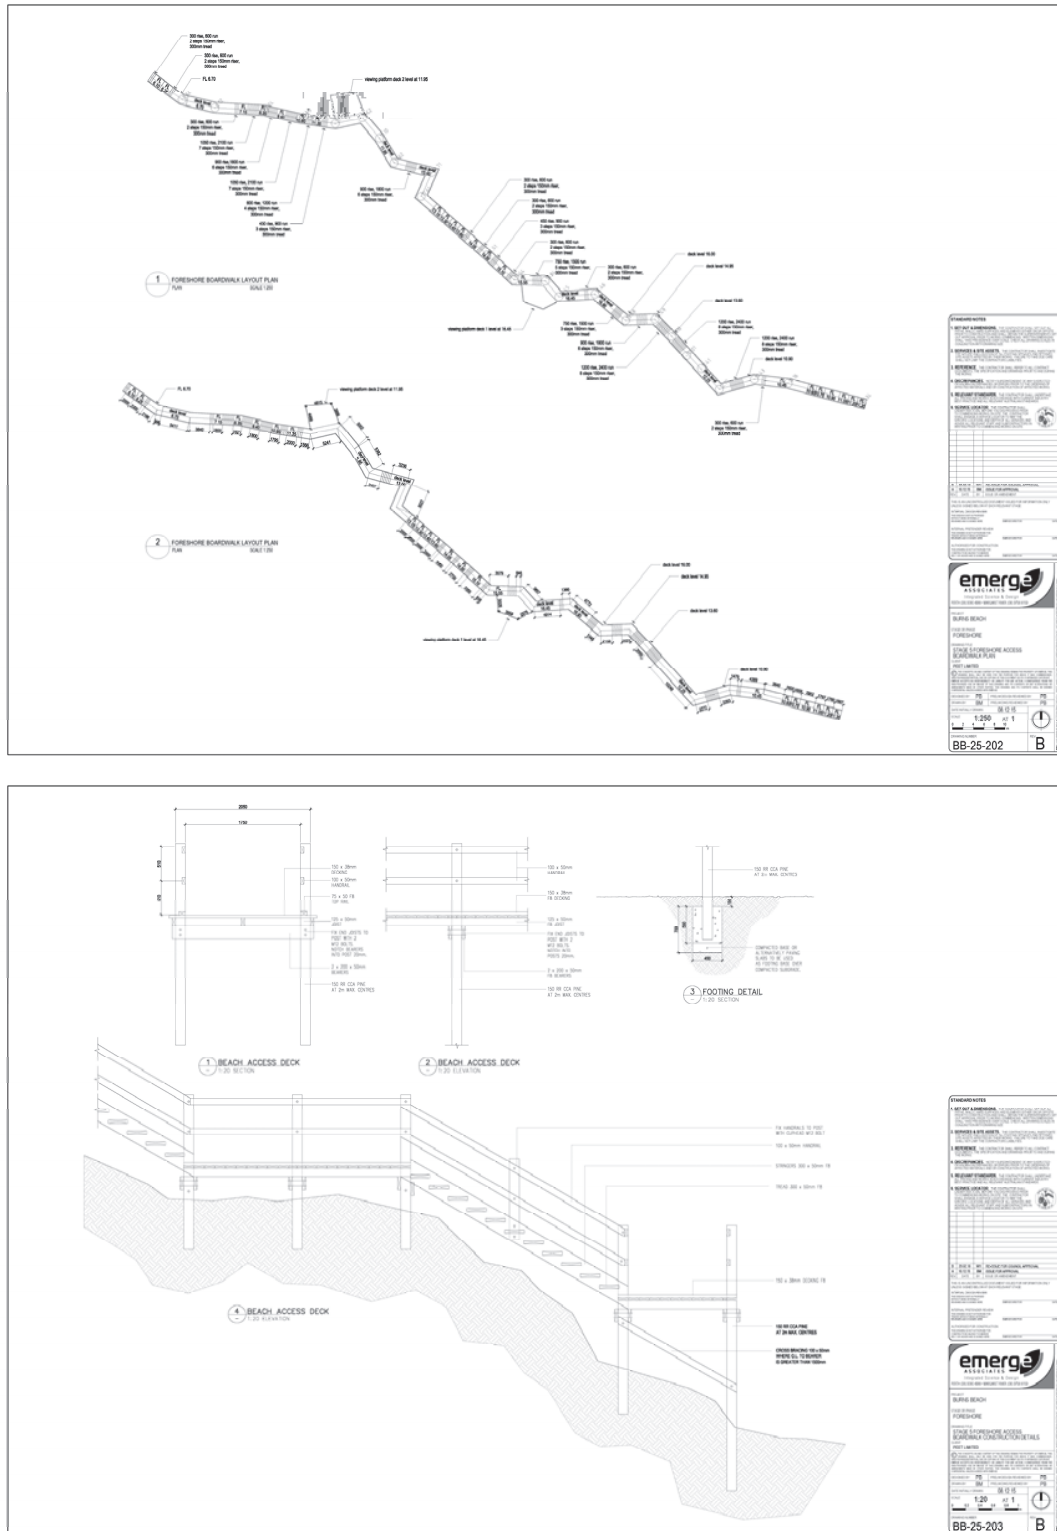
Example of Boardwalk setout and construction detailing (from earlier Stage 2 approval 2015-16). A similar set of detailed plans would be prepared for each landscape stage.
